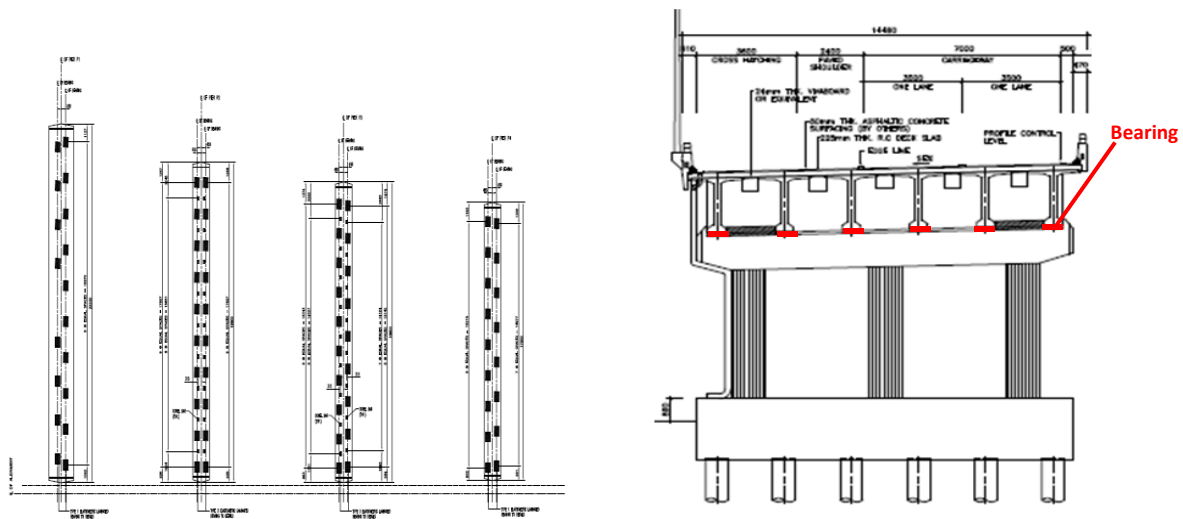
Example of isolation bearings layout plan (bearings are shown in black squares) and section through package 3 T section and slab deck , piers and pier cap and piles and pile cap.
